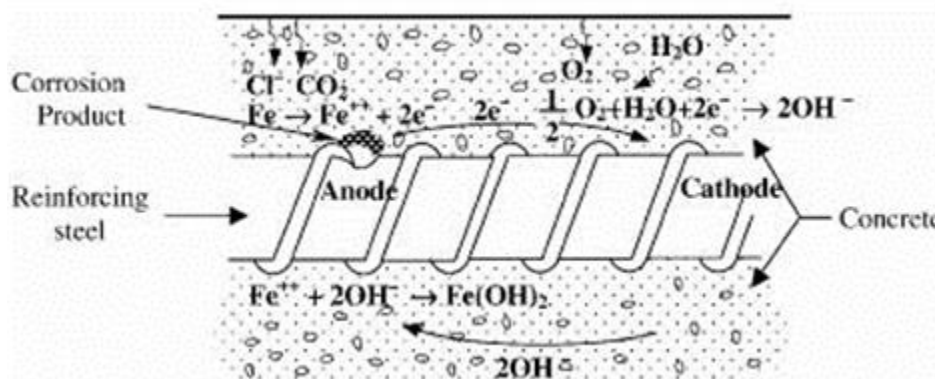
Schematic illustration of the corrosion of reinforcement steel in concrete (Ahmed 2003)
